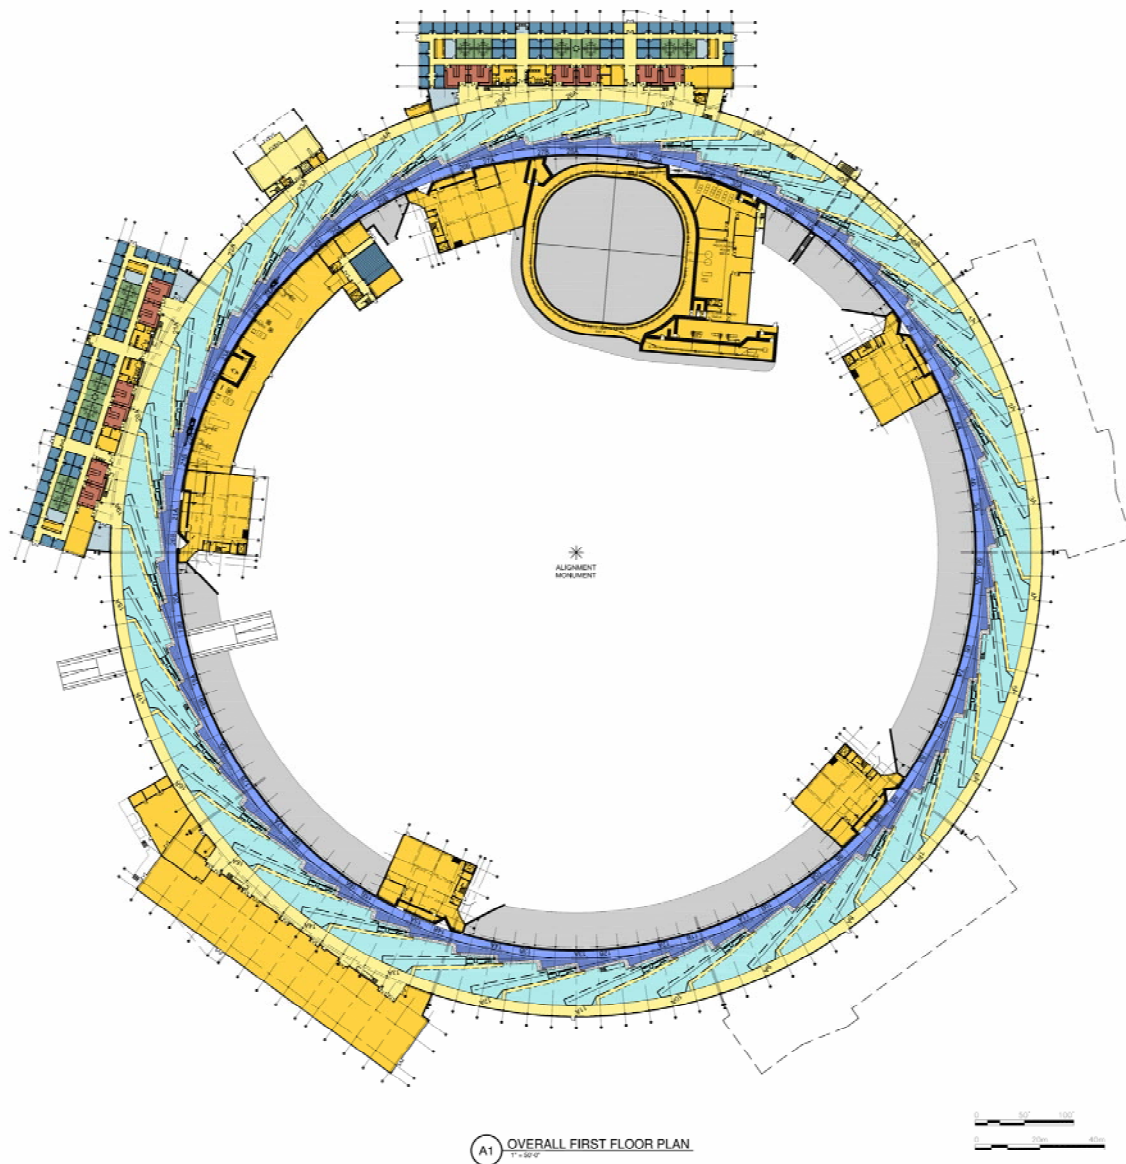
NSLS-II Complex Layout – First Floor Plan.
